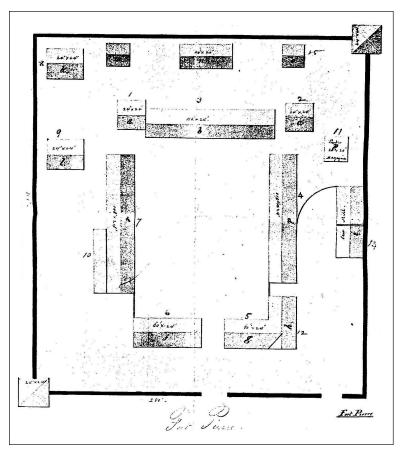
Plan view of fort by Pierre Chouteau, Jr., sent to Quartermaster General Jesup (National Archives, Washington, D.C.)
